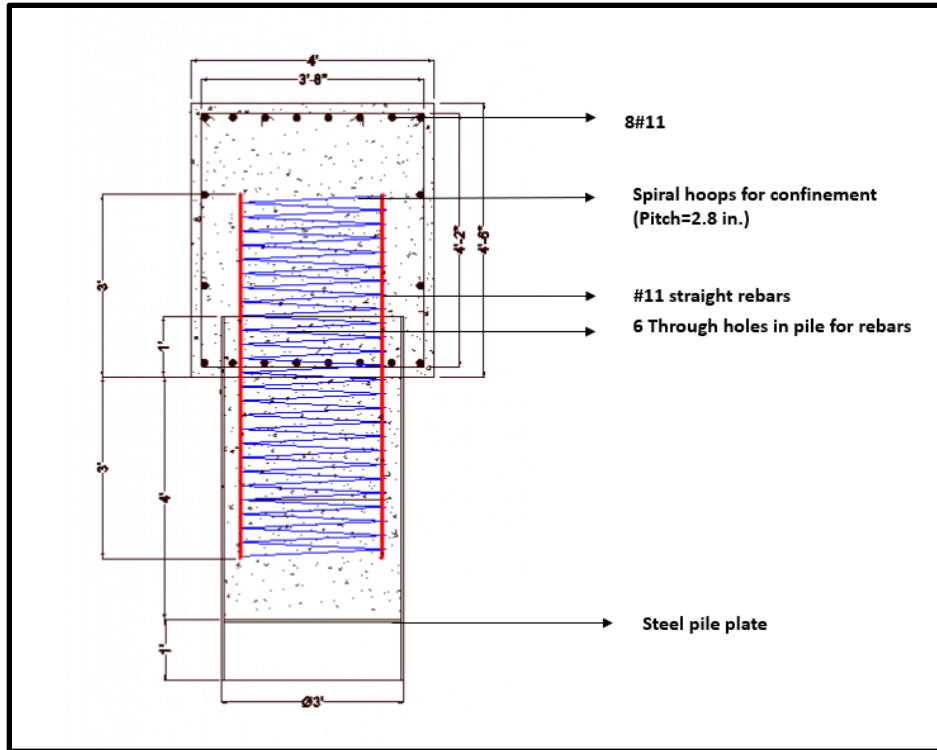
Typical Specimen With Non-Contact Lap Splice Connection; O1: Straight Rebars
